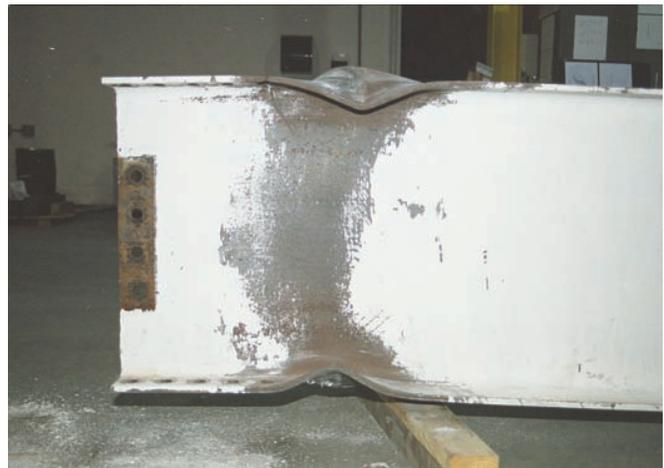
Beam from connection FS-07. White-wash spalling indicates the formation of a plastic hinge.
